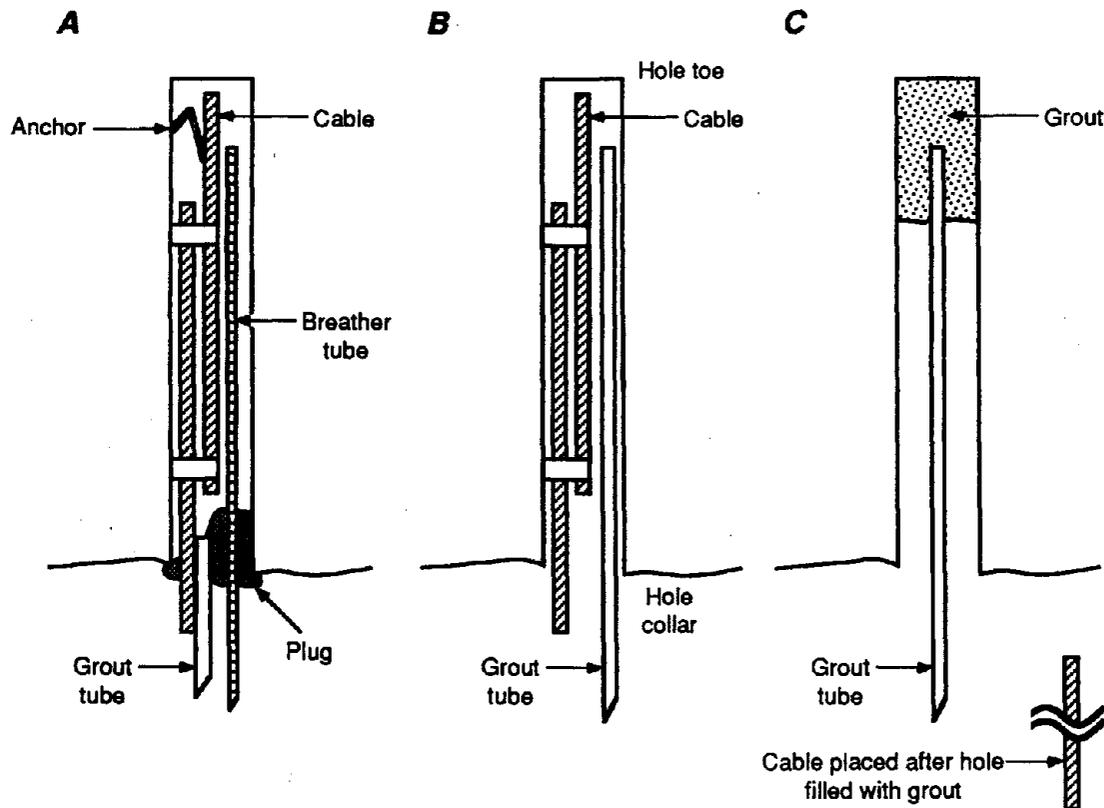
Techniques for installing cable bolt supports. A, Breather tube and grout tube used to grout hole; B, grout tube alone used to grout hole; C, cable placed after hole grouted (Bourchier and others, 1992).
